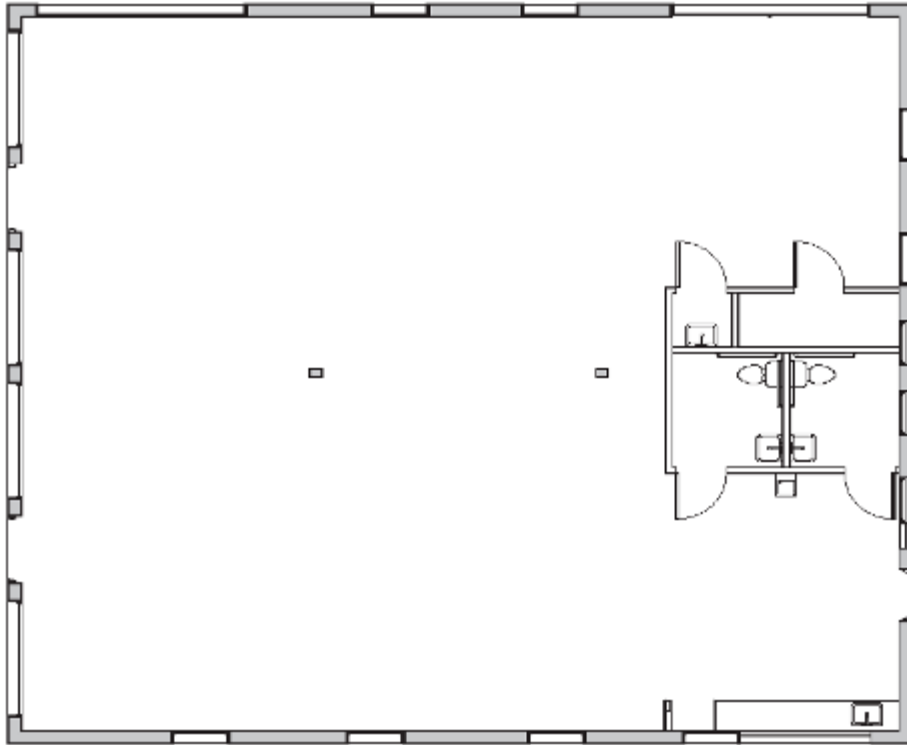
Existing Site Plan 2022 by Urbano Architects.
